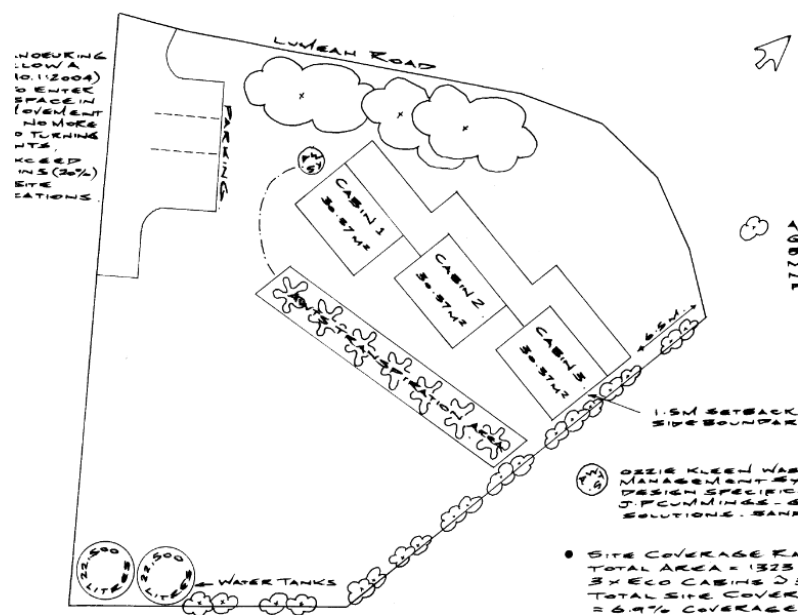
Extract of approved plans under DA-2012-36 showing the site plan
